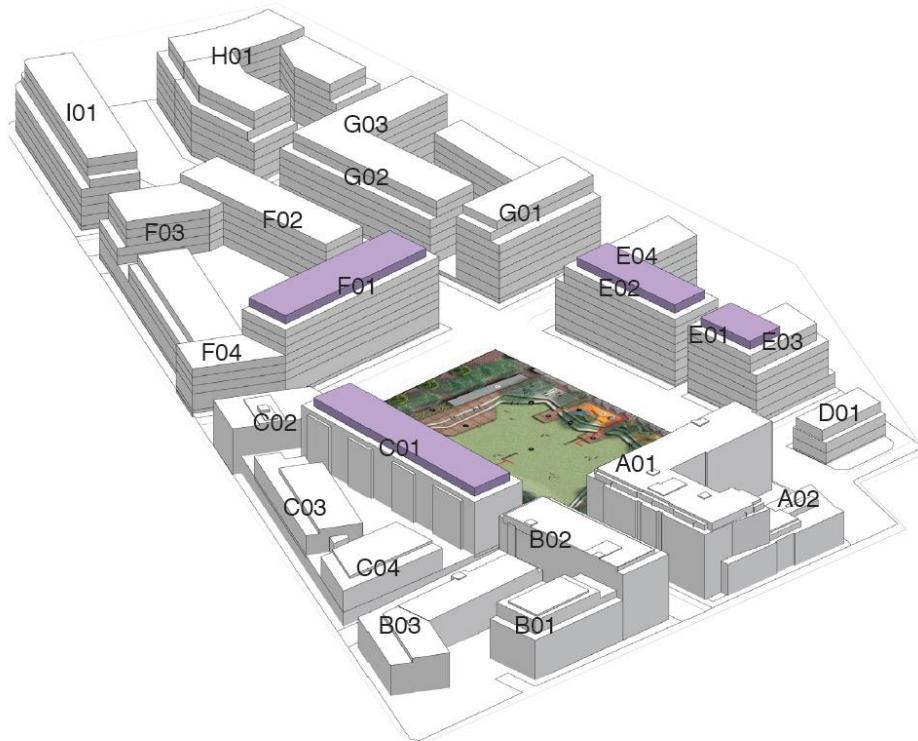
Proposed axonometric concept plan. The changes relate to Blocks A01, A02 and D01.
